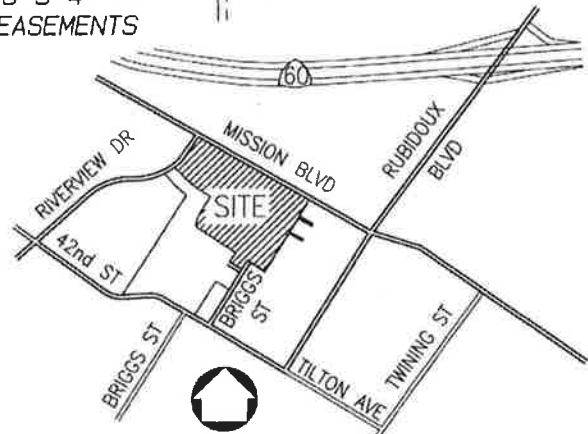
# EXHIBIT "C" - SITE PLAN CERTIFICATE OF PARCEL MERGER NO. 01881
